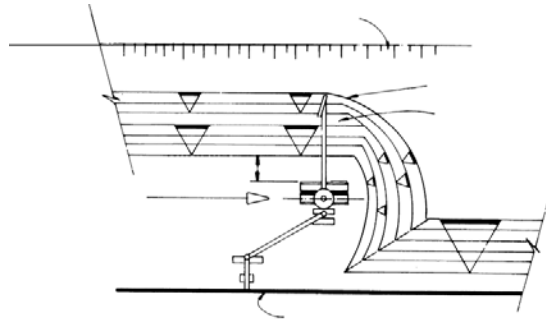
Maximizing the upper excavation face advance for toe stabilization
